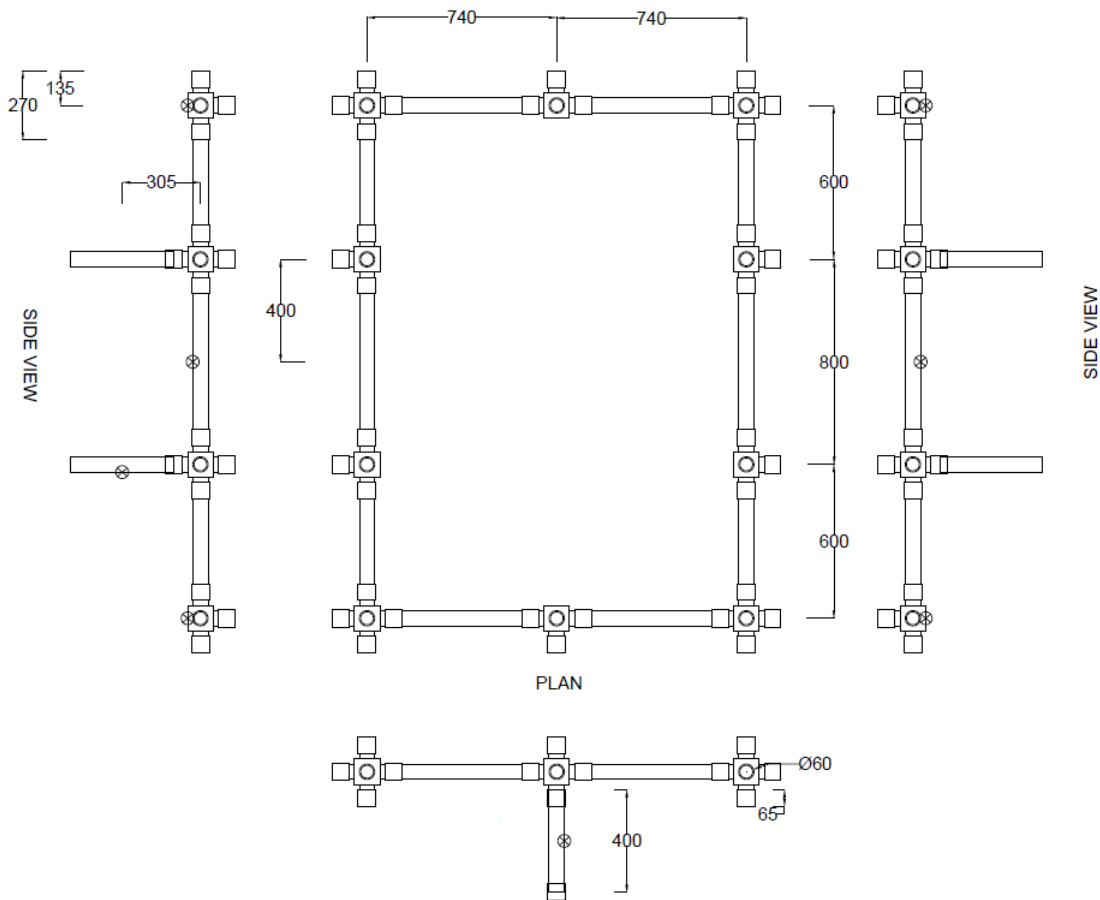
Plan of the structural frame. All dimensions are in mm.
